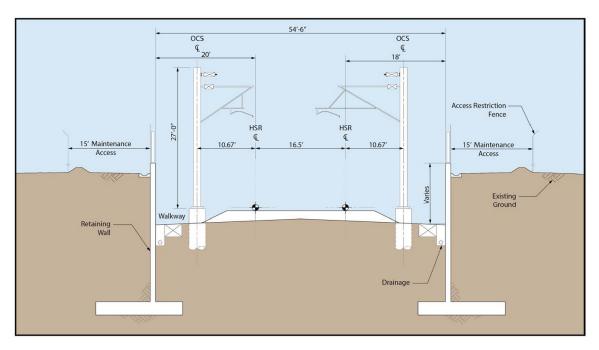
Typical High-Speed Rail At-Grade Cross Section (Cut)
